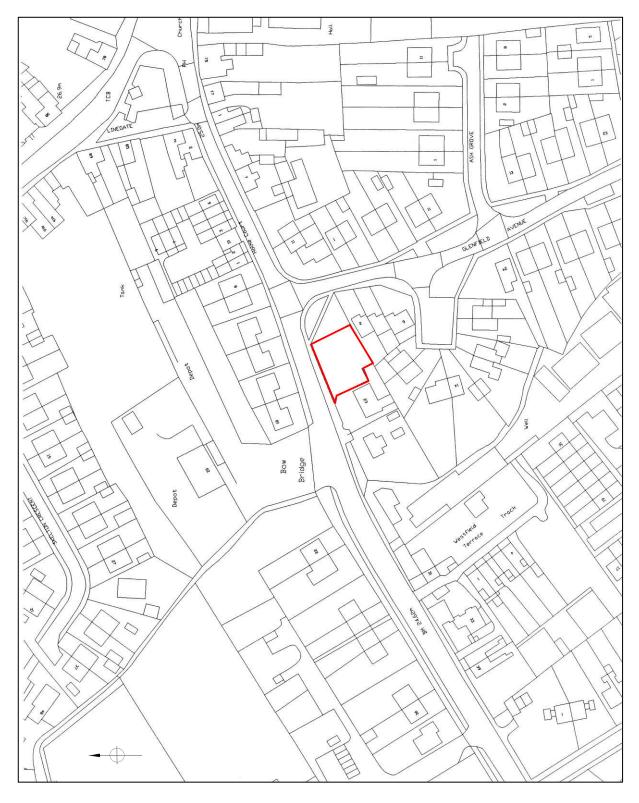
SITE LOCATION (not to scale - plan supplied by Building Design Architects)
